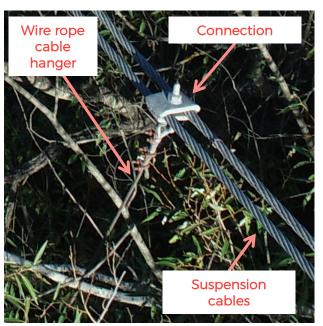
Typical wire rope cable hanger top connection to suspension cables
